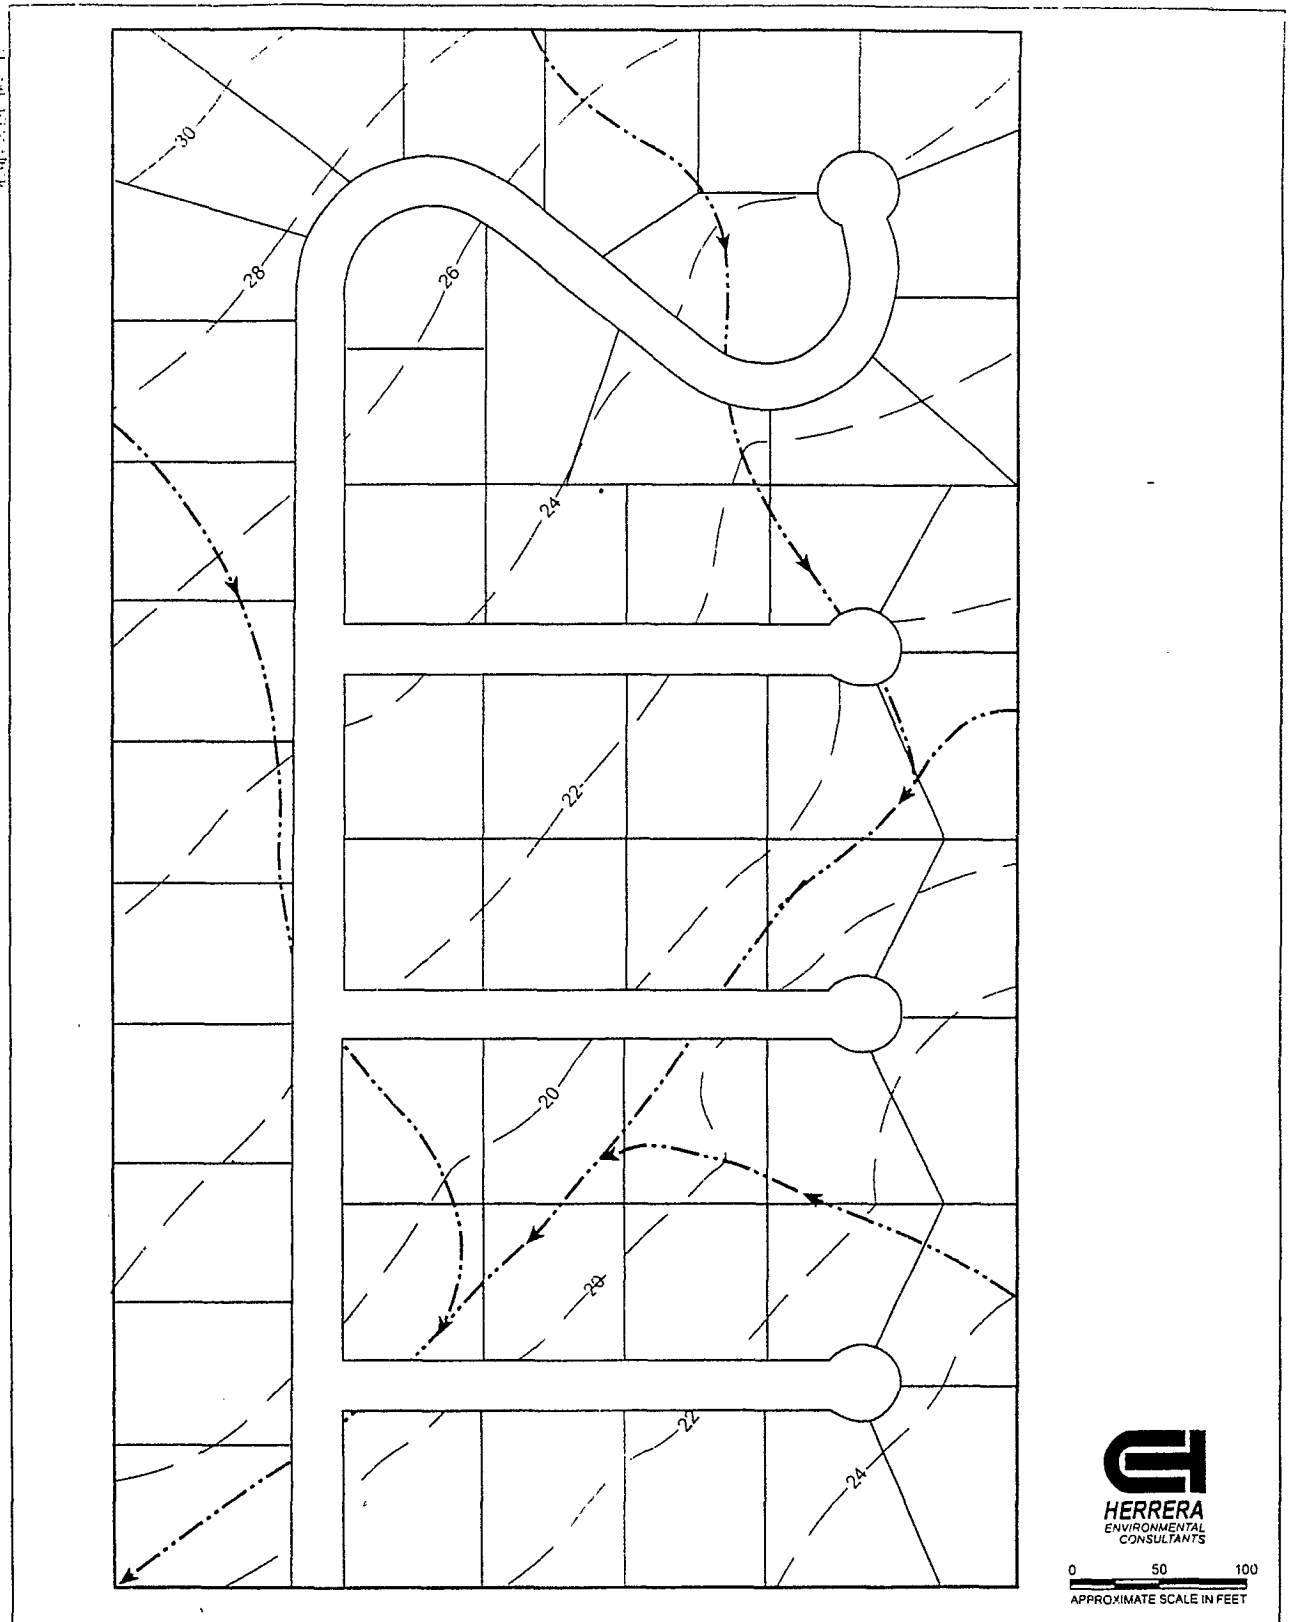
Ten-acre residential development plan, without stormwater facilities, superimposed on natural (pre-development) topography and drainage features.
